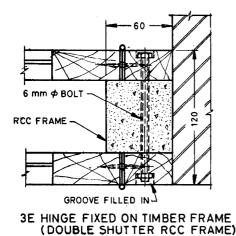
Arrangements for Fixing Hinges to Precast Reinforced Concrete Door and Window Frames — Contd
